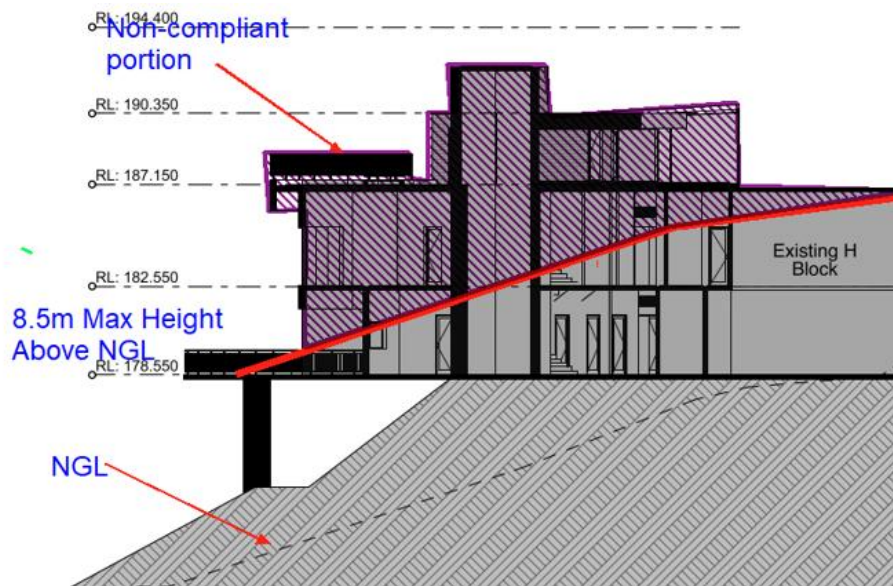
Extract of Section Plan showing height contravention under DA/1234/2015
